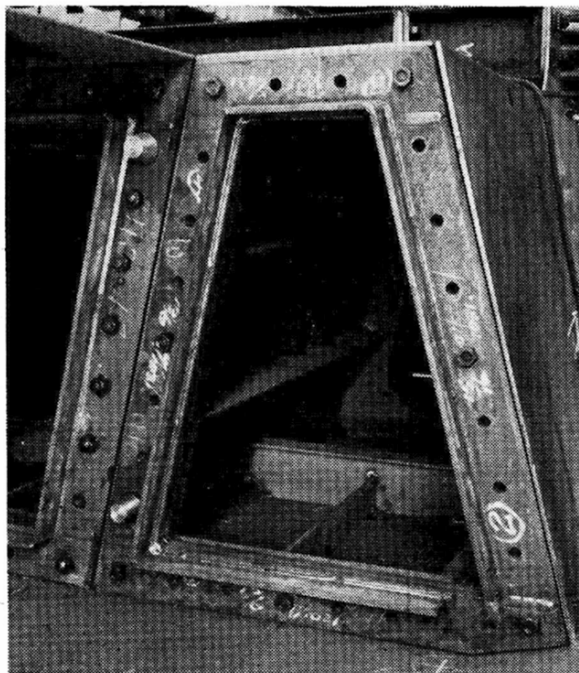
THE FLANGES OF A UNIT BOLTED AND DOWELLED TO ITS ADJOINING UNIT DURING FABRICATION, UPSIDE DOWN ON A JIG
